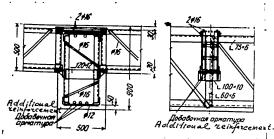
Connection between the steel welded skeleton of a girder and a beam.
